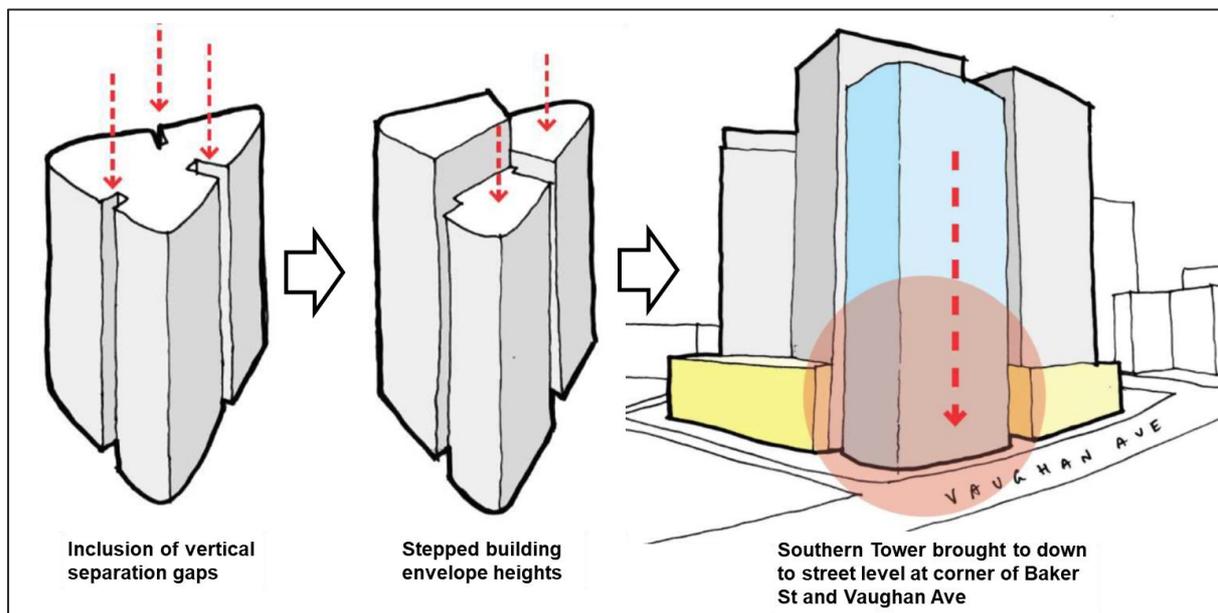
| Amendments to the Southern Tower, including stepped heights, vertical gap separation and grounding of tower at corner of Baker Street and Vaughan Avenue (Base source: Applicant's RtS)
